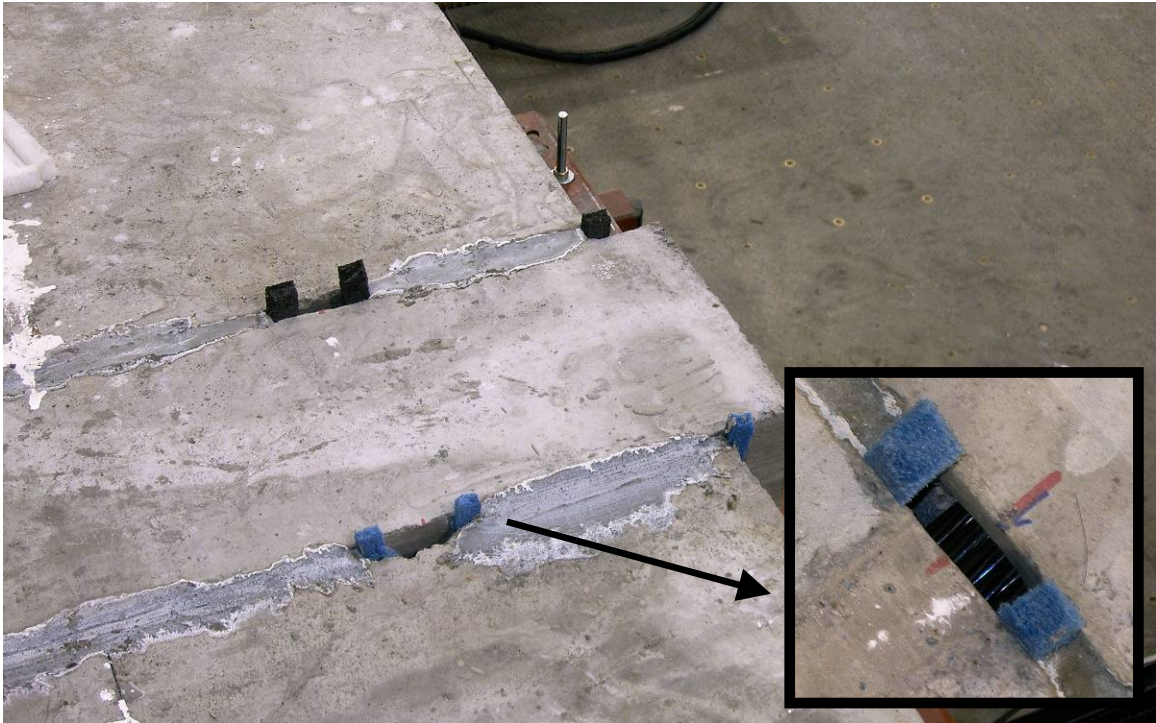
Sealing ducts for longitudinal post-tensioning prior to grout pour (top view).
